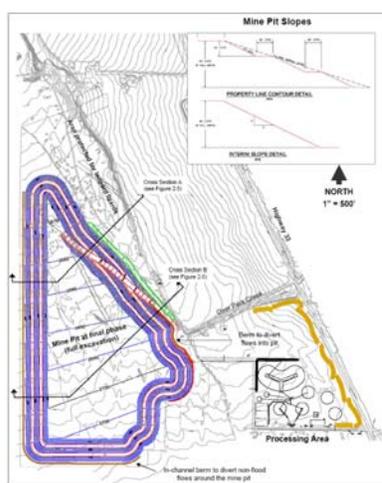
Proposed Final Mining Plan (Phase 2 - Full Excavation)
